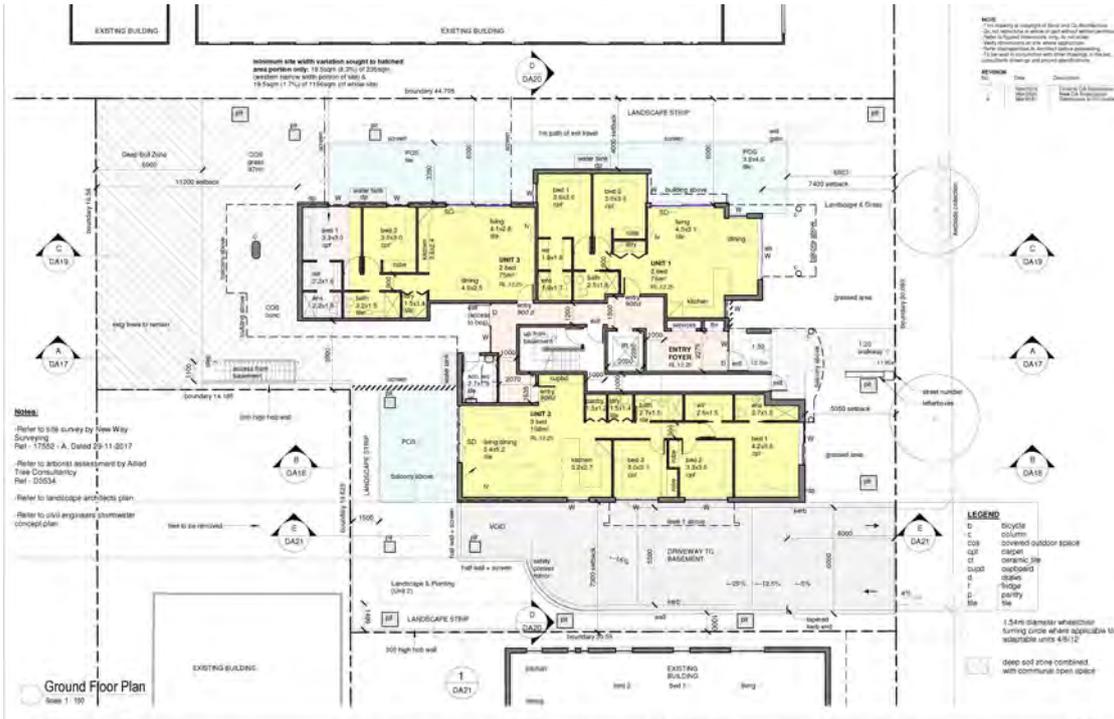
Site Plan - Proposed (Source: Borst & Co Architecture)
